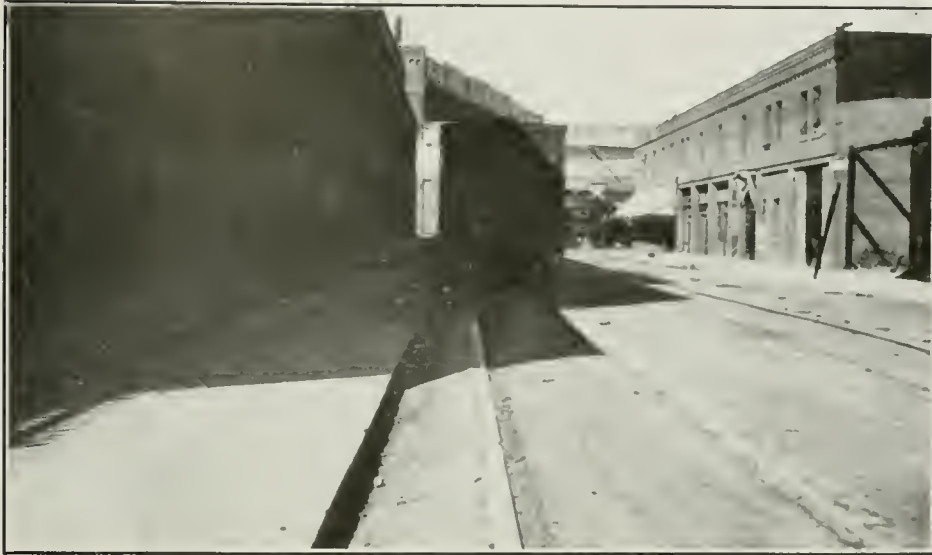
SIDEWALK USED FOR UNLOADING PLATFORM
